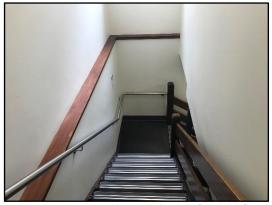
Internal view to the stairs leading from the first floor to the ground floor of the Tissue Pathology and Diagnostic Oncology building.
